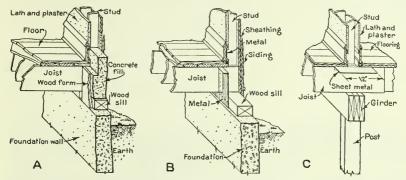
Methods of rat proofing stud spaces in old buildings: A, Construction at outer wall. Open stud spaces are filled with weak concrete, which is placed by removing the skirting above. If the work is done a little at a time, the wooden forms can be removed when the concrete has set, and used again. B, Another method employing sheet metal secured to sill, joist, and flooring. C, Post and girder in basement supporting partition with open stud spaces. Sheet metal nailed to joists and floor and fitted about the stud prevents access to upper floors
